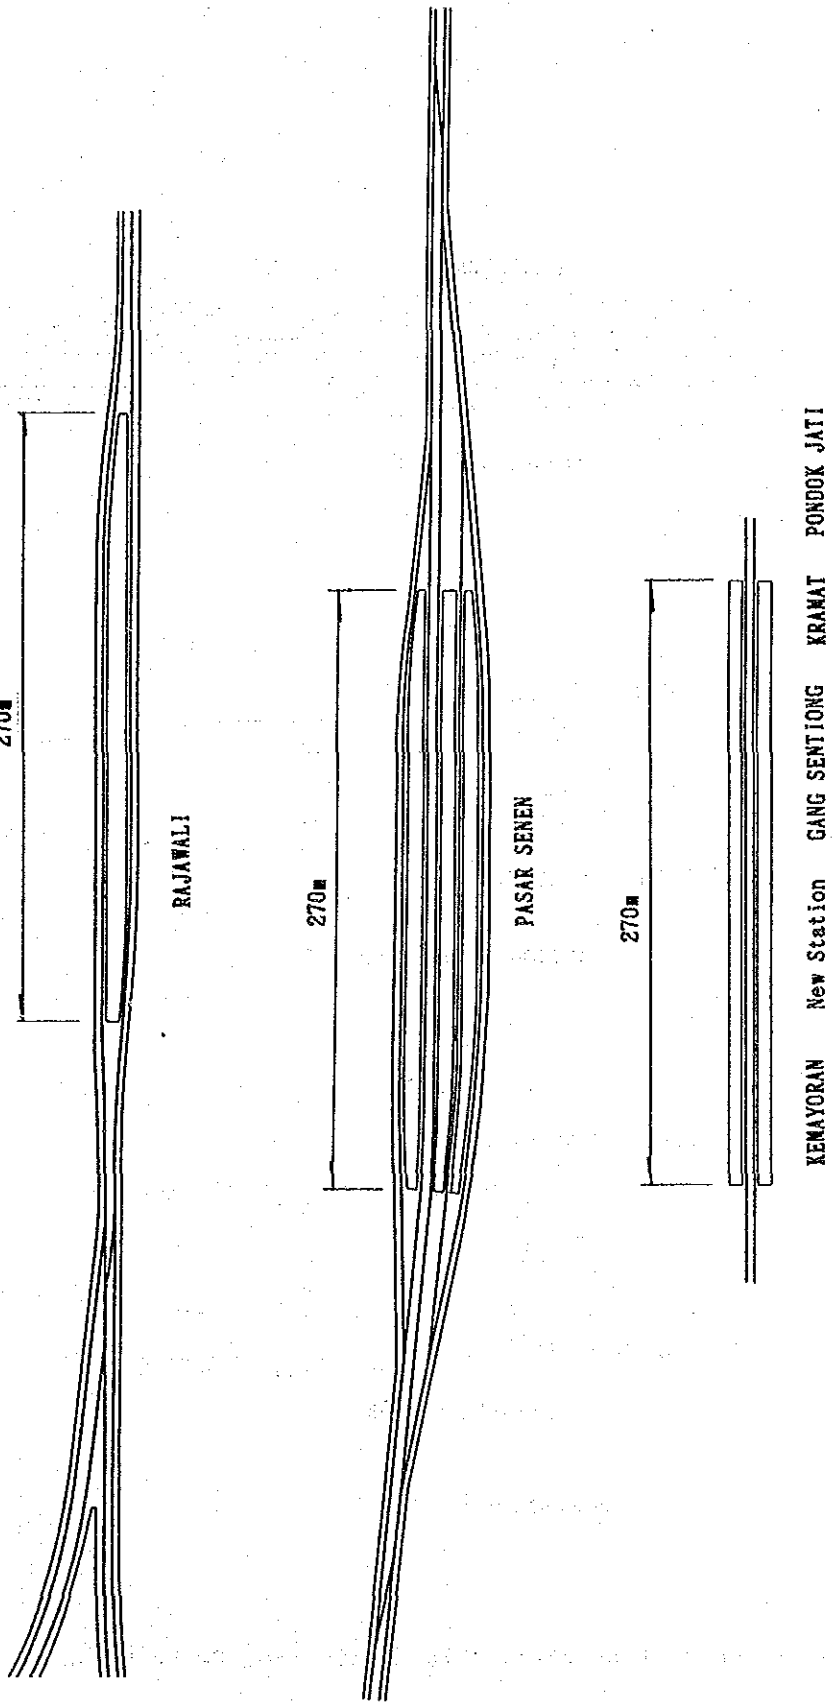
Track Layout Plan of Station Yard
